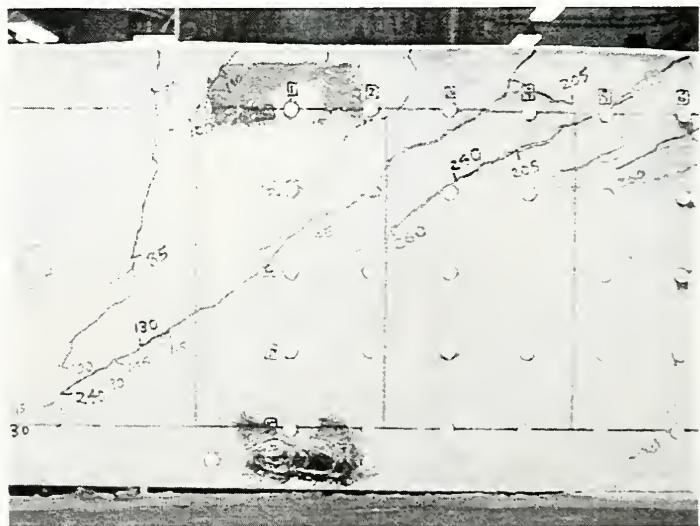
Specimen 2-NWLB at Failure, East Face, South Central Test Region
